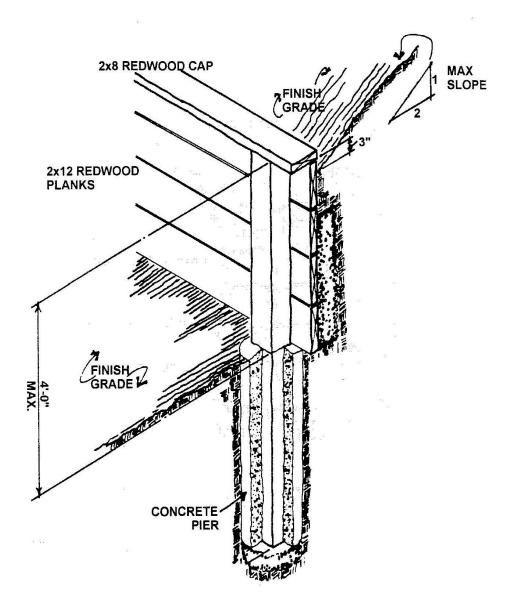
Example: Wood Retaining Wall
